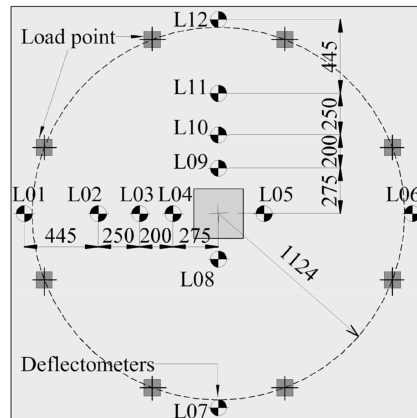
Loading and deflectometer arrangements as used in the test system (all dimensions mm)
